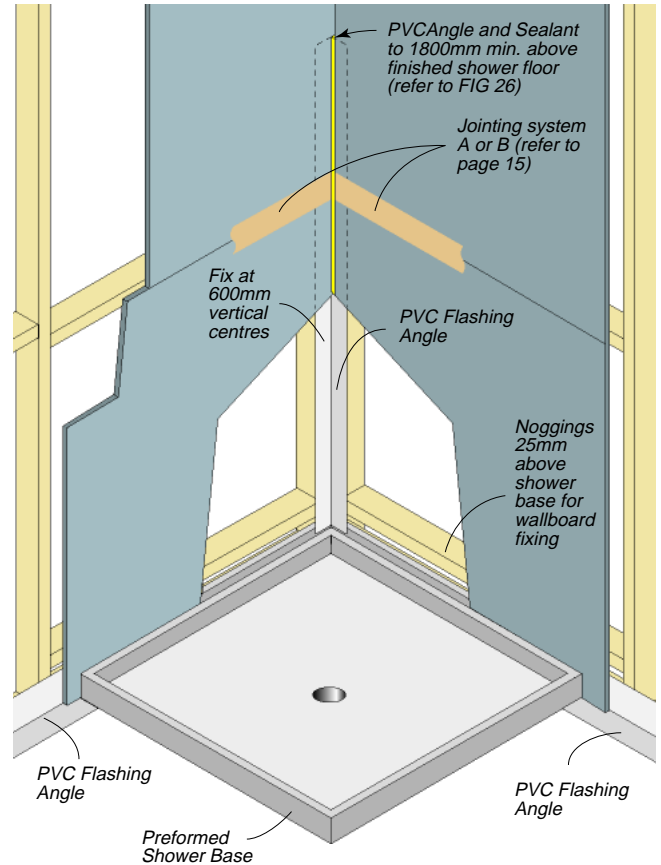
PREFORMED SHOWER BASE ON SHEET FLOORING.
